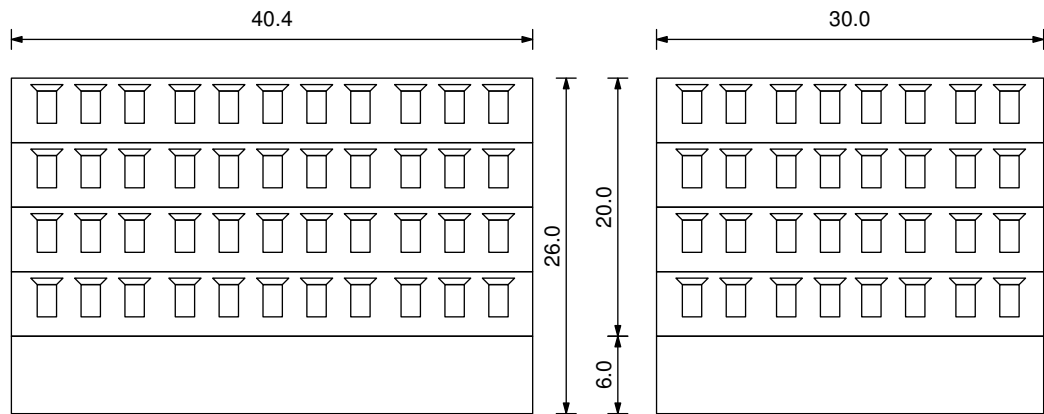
Elevations of long and the short facades (dimensions in meters).
